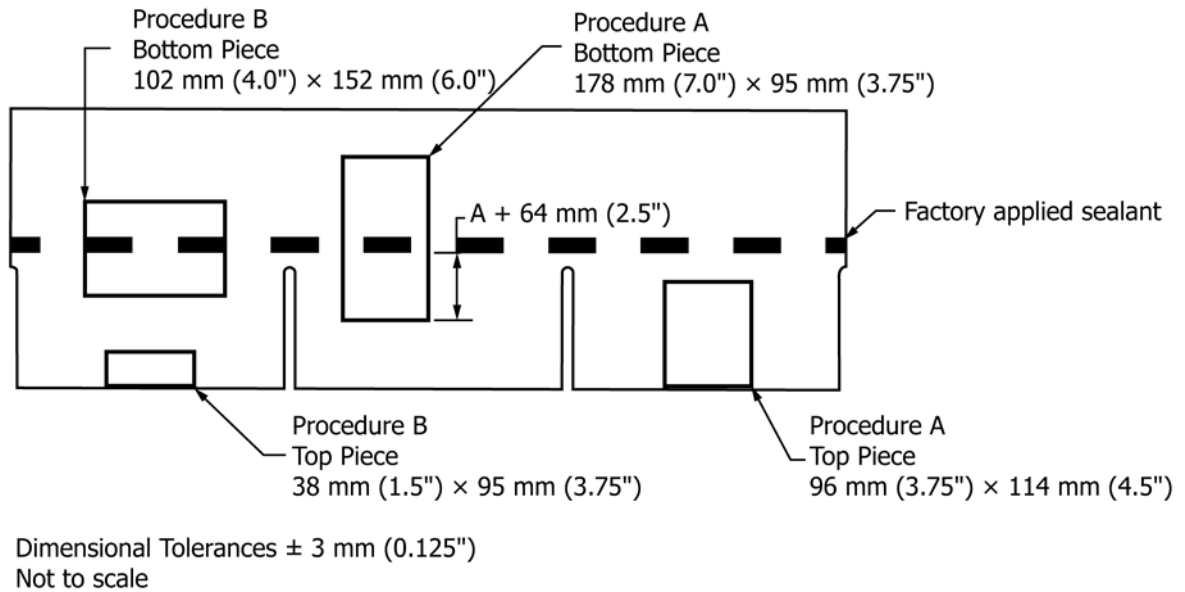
Plan View of Shingle-Layer Shingle Showing Typical Specimen Locations
